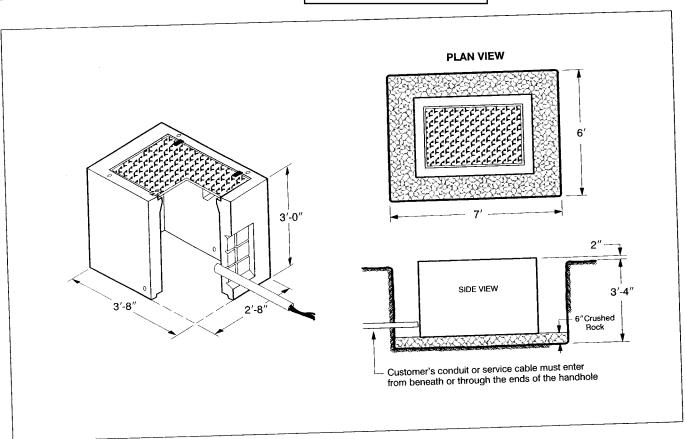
Dimensions and excavation requirements for a small, secondary connection handhole
